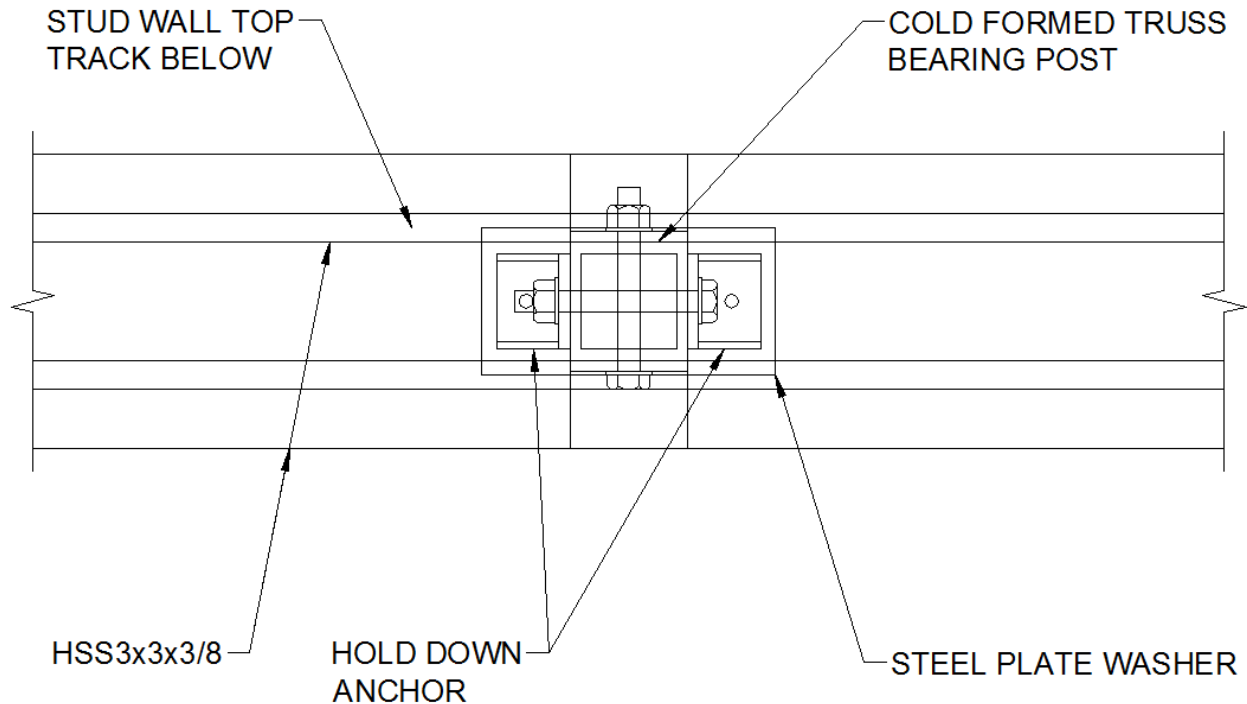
Roof Beam Tie Down Anchorage, Plan View
